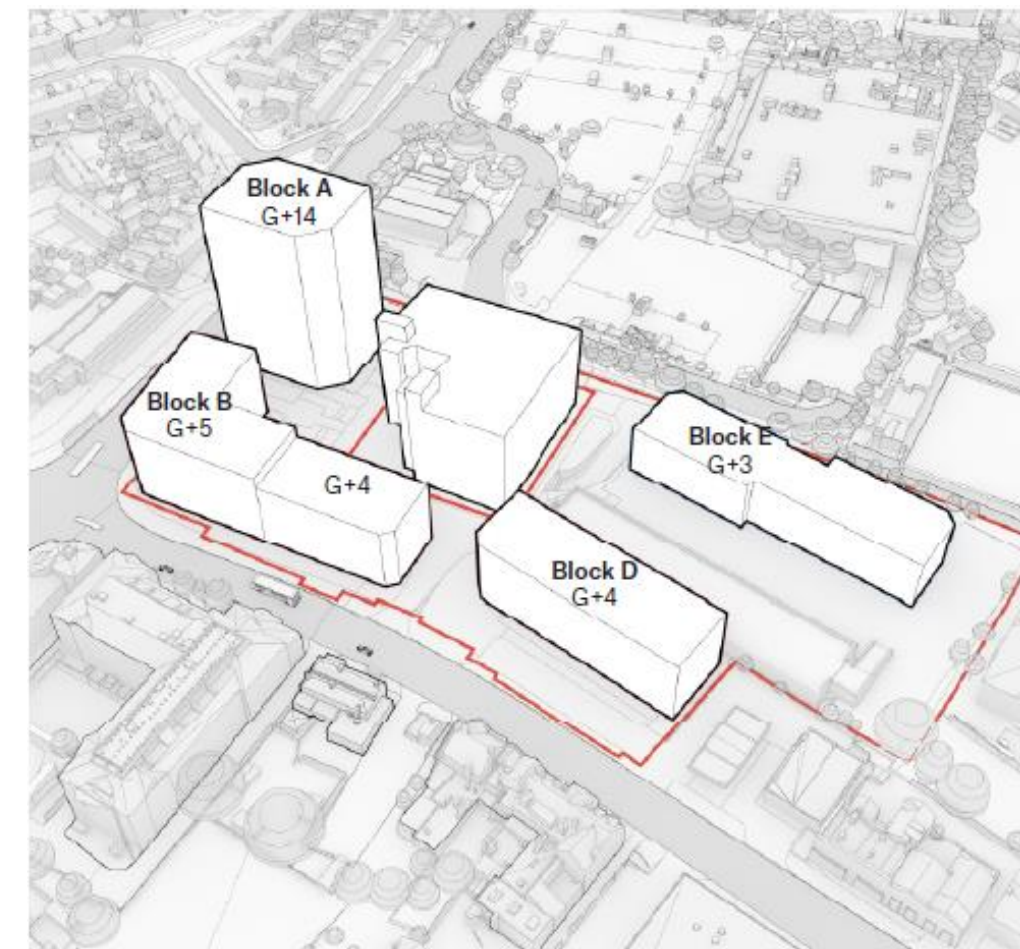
Extract of proposed Site Layout and Block Heights / Massing Principles of Proposed Development (AFK Studios)
